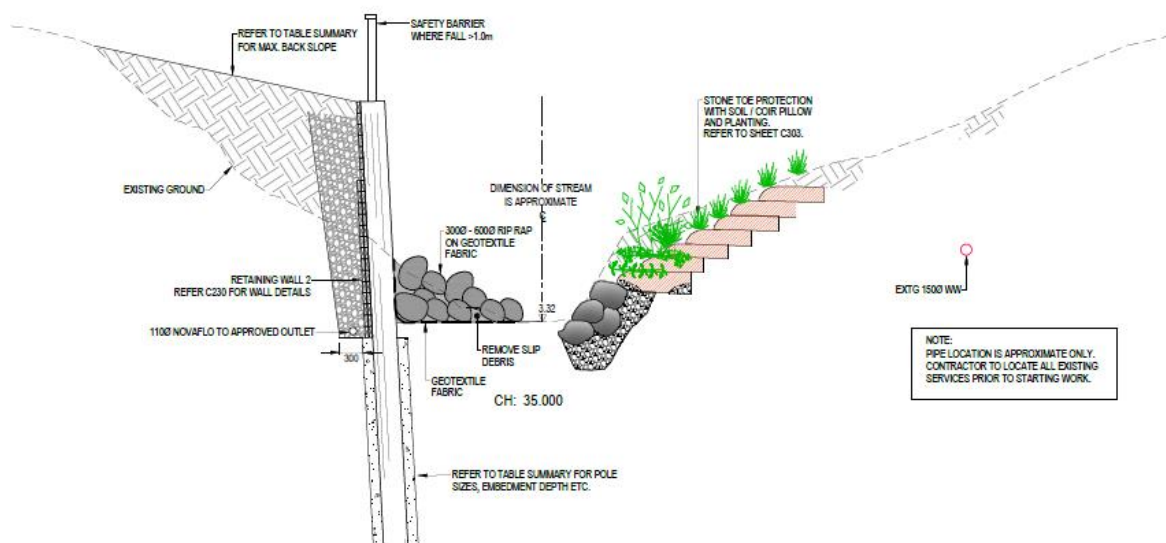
Stone toe protection with coir pillows and planting across from a timber pole retaining wall as part of the remedial works.
